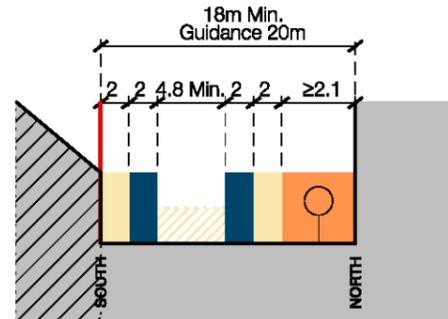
Street coding section: between Plot A and the Parish Rooms.
